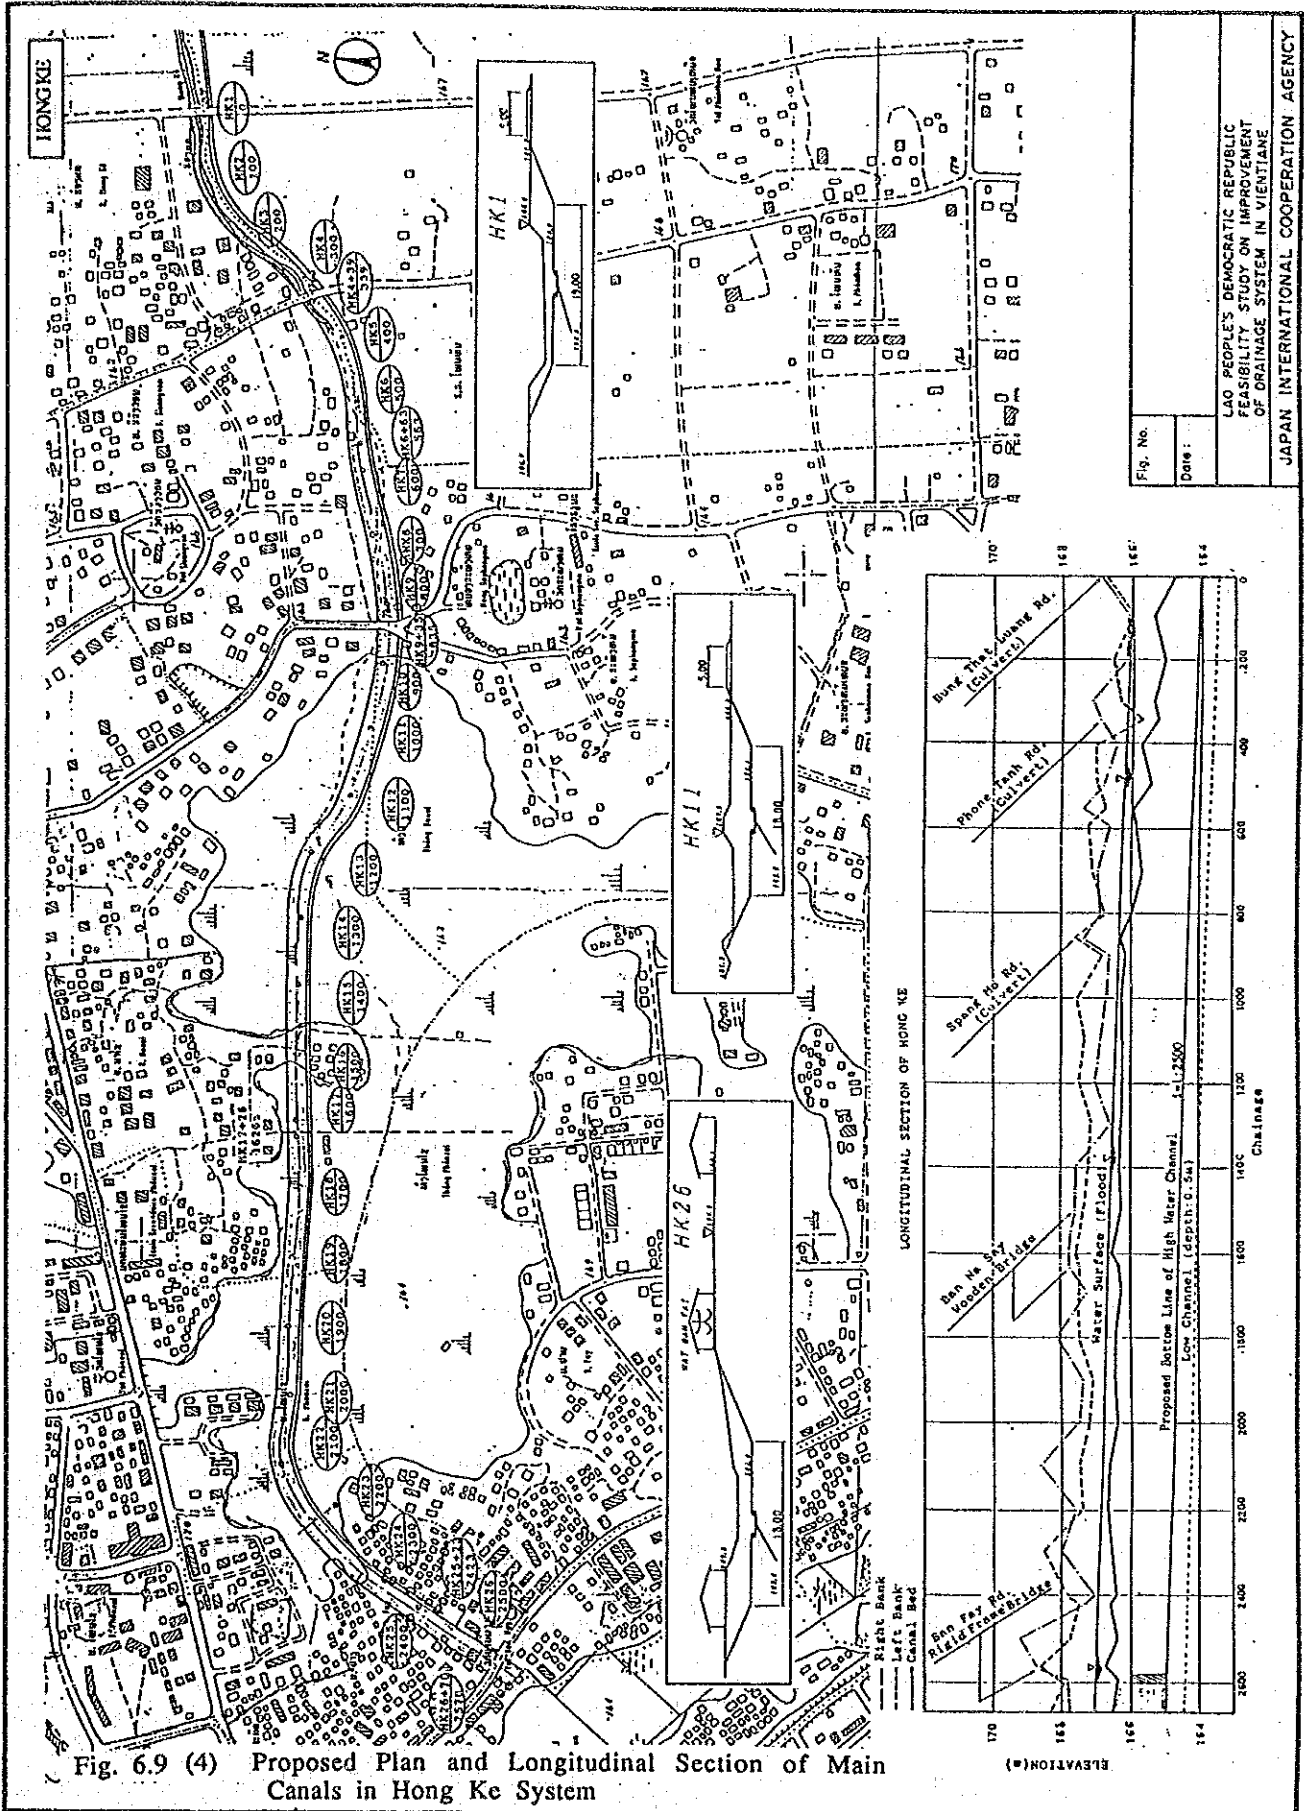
(3) Proposed Plan and Longitudinal Section of Main Canals in Hong Ke System
